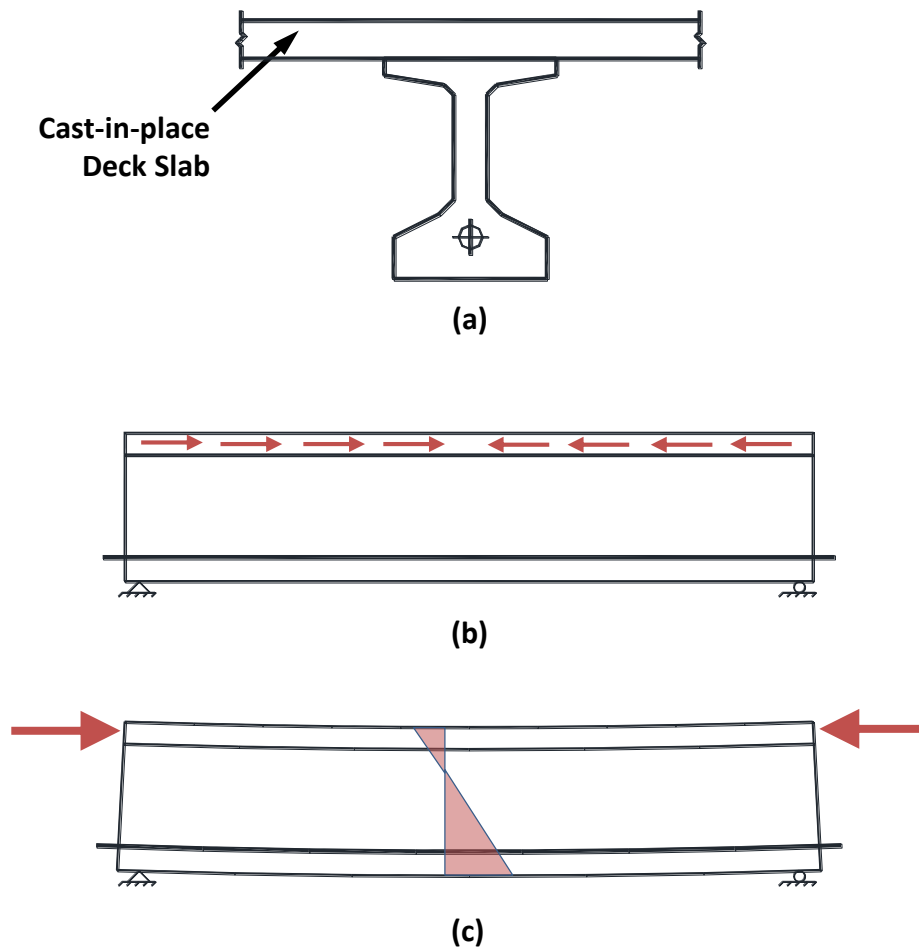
For shrinkage of deck concrete the cast-in-place slab in the (a) assumed section causes (b) a differential shrinkage force that is (c) resisted by the beam
